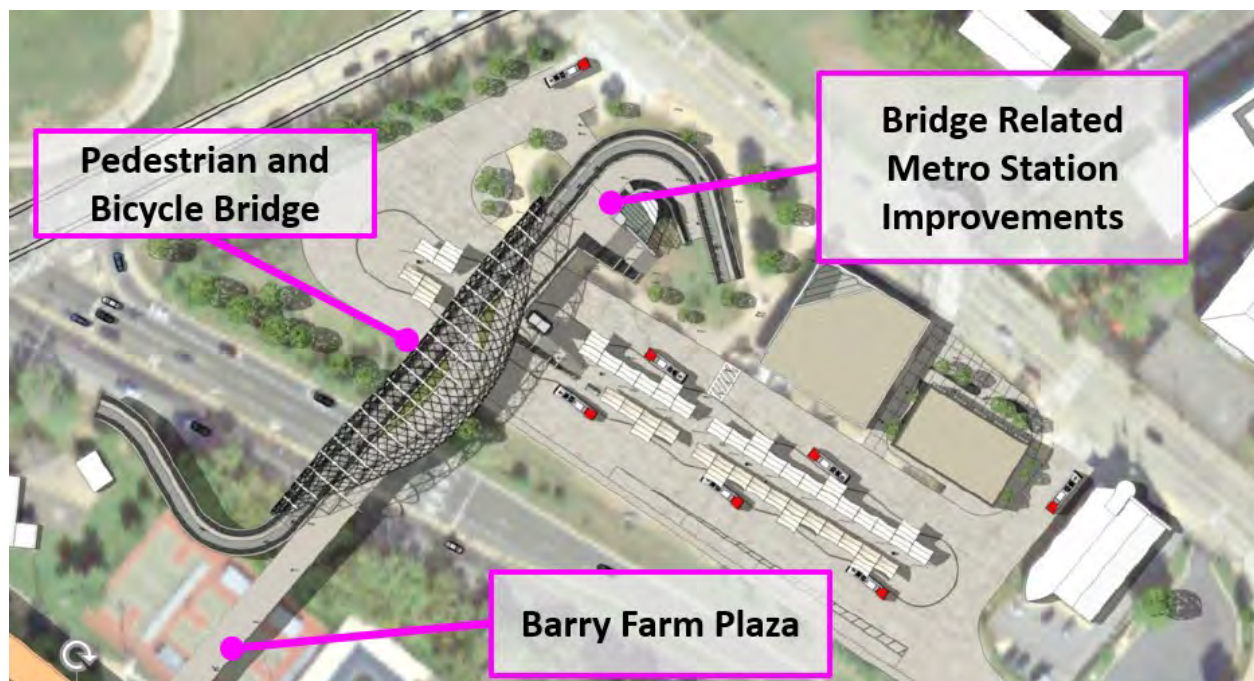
| Concept B Pedestrian / Bike Bridge and Site Plan from WMATA 2016 Joint Development Analysis
